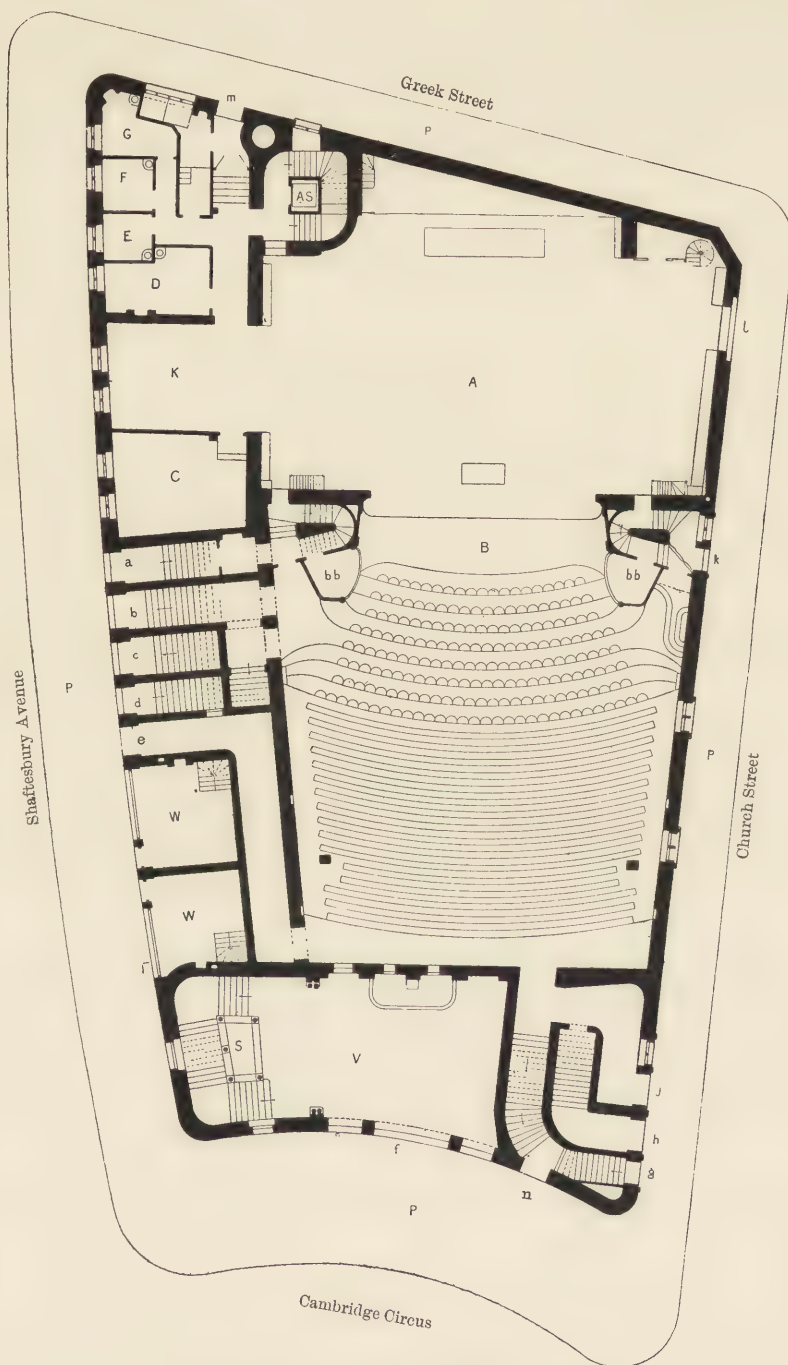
PLAN AT LEVEL OF STREET PAVEMENT.
